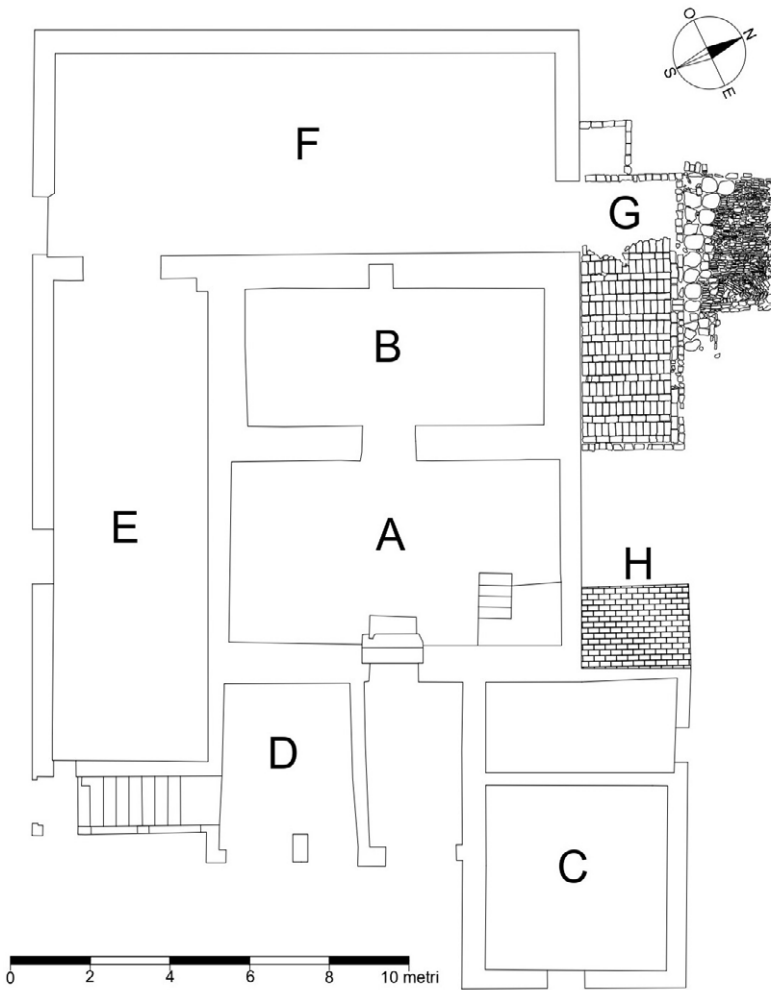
Plan of the building known as 'Tappatino' (author's elaboration).
